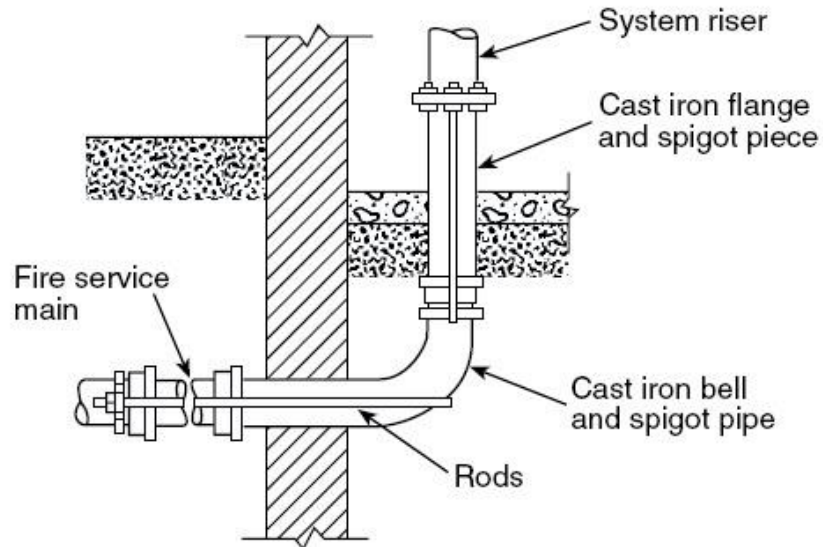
(b) Typical connection to a fire protection system riser
